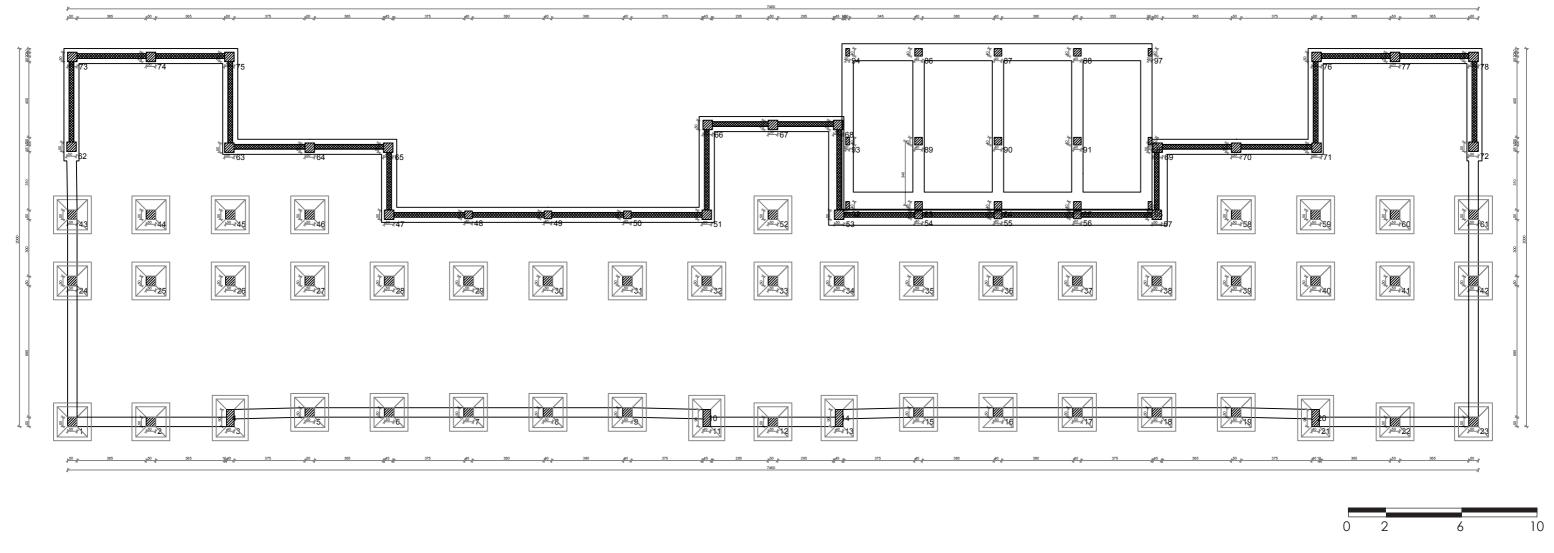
Foundation's Plan Quote +/- 0,00 m | Scale 1:200
